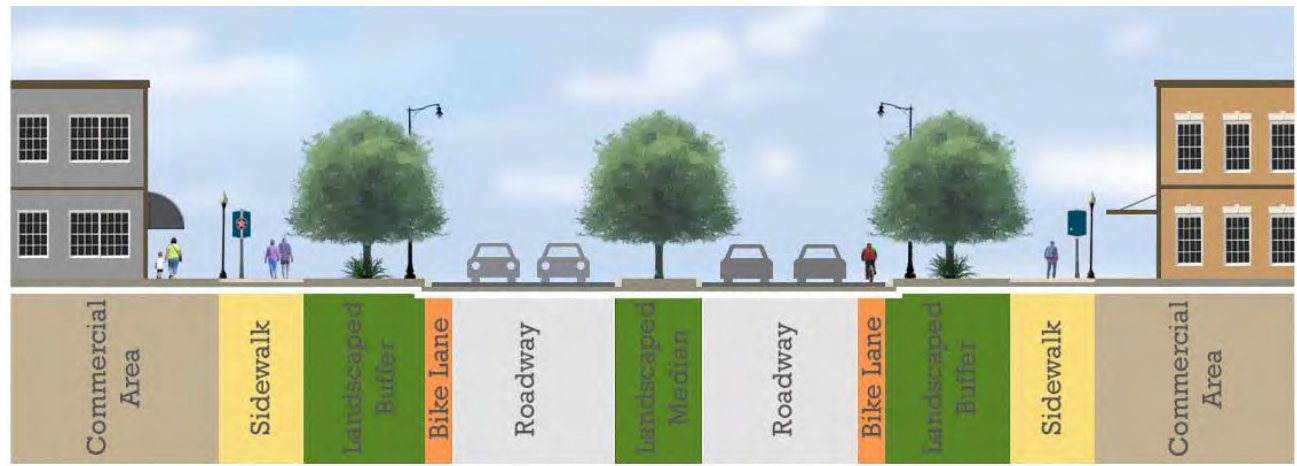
Illustration of Potential Gillespie Street Improvements. Unattractive areas and land use along Gillespie Street should also be addressed. An overall vision for this proposed new corridor linking the Crown Coliseum Complex to Downtown Fayetteville should be developed. That vision should address all elements of the streetscape. Any new structures should be compatible in mass, scale, colors, and materials. Long range plans should also include bus or a trolley service between the Coliseum Complex and Downtown Fayetteville.
